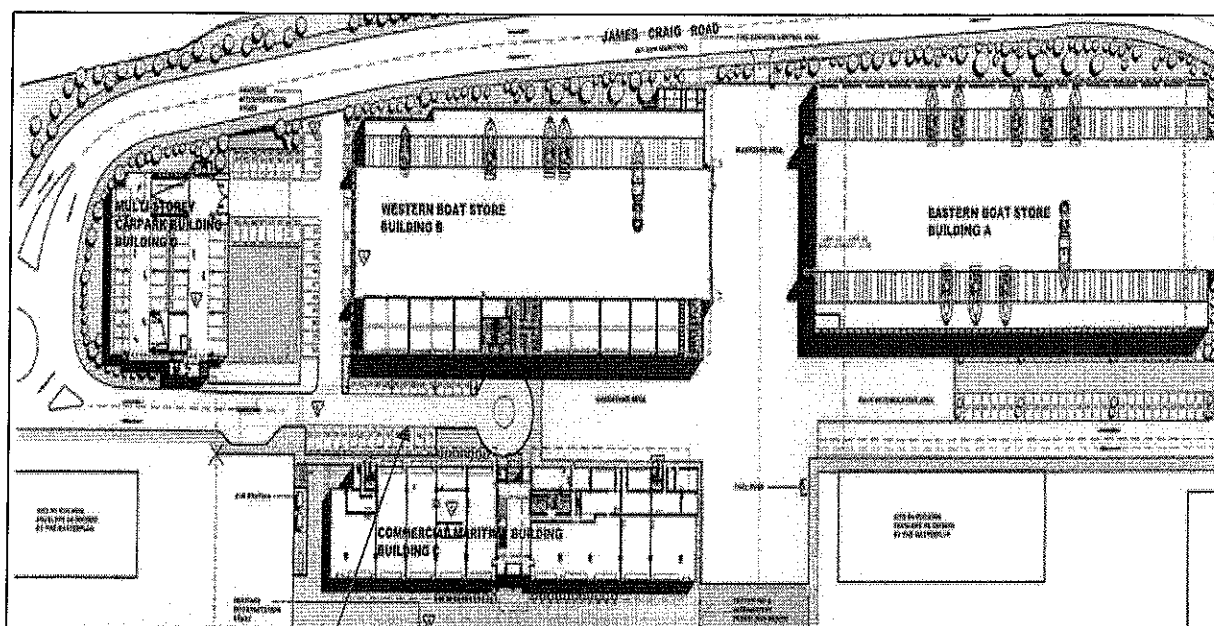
Proposed parking between the western boat store & commercial maritime building.
